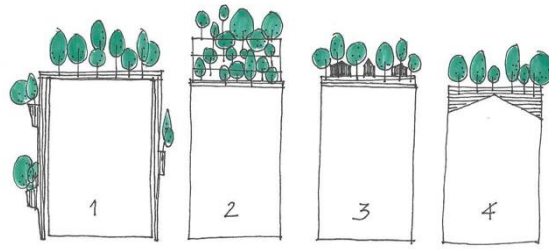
1_ Orverhang with common intermediate layers; 2_ Adding vertical parks (stacked); 3_ Adding private gardens + facilities + community workshops; 4_ filling up pitched roofs
